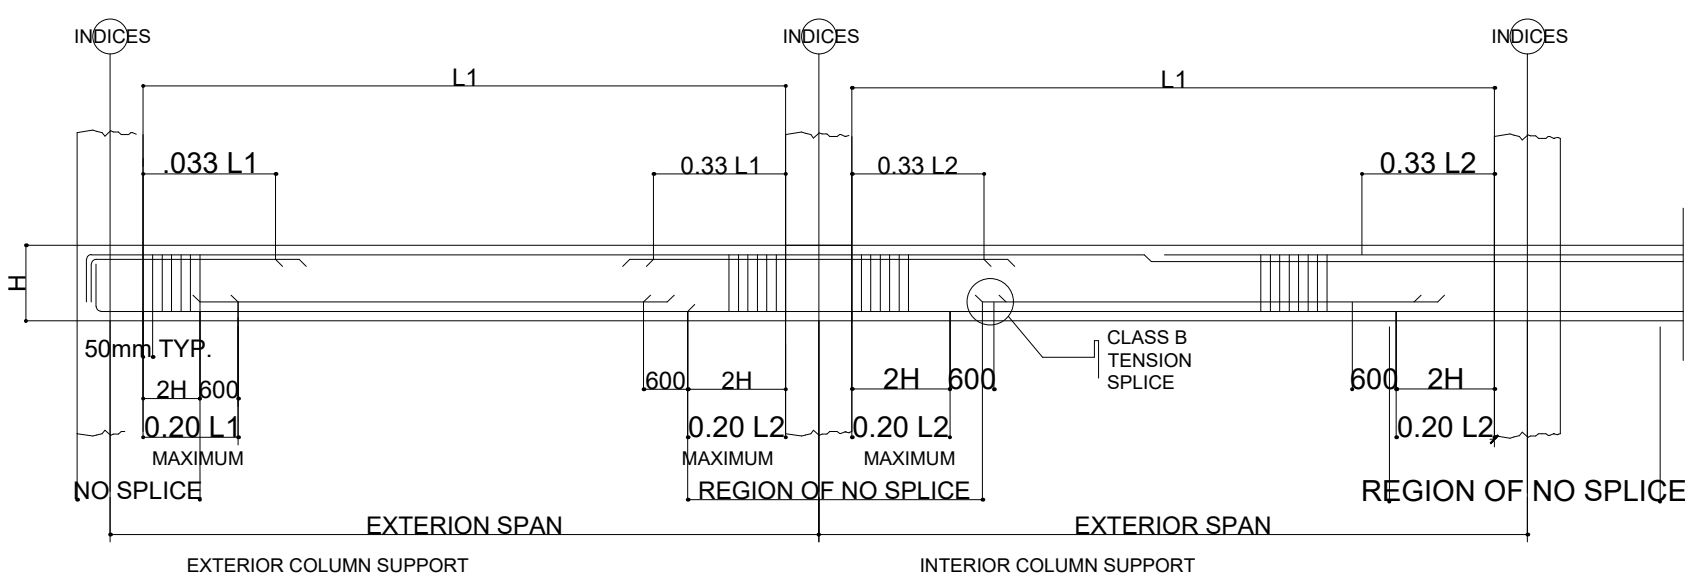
TYPICAL BAR DETAILS FOR PRISMATIC GIRDERS
